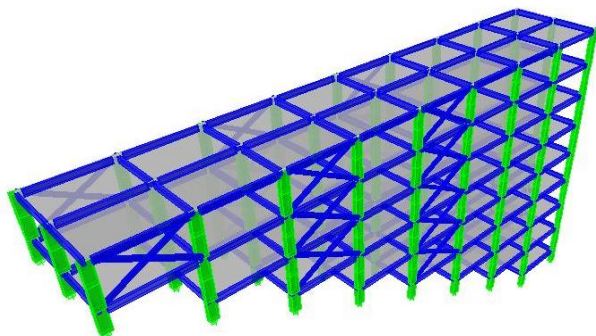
Shows a typical 3 D view of Step back building frame with bracings.
